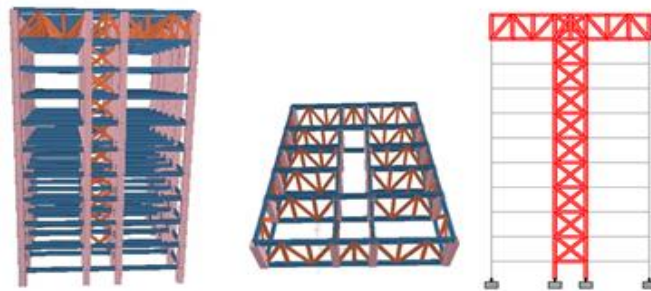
Steel Frame with Braced core, Belt Truss and Outrigger trusses (Model 3)
